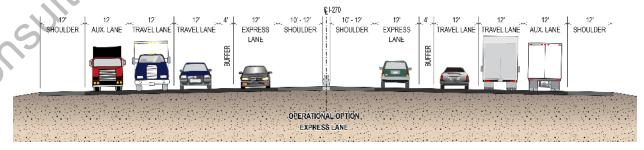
Typical Roadway Section with Auxiliary Lane
